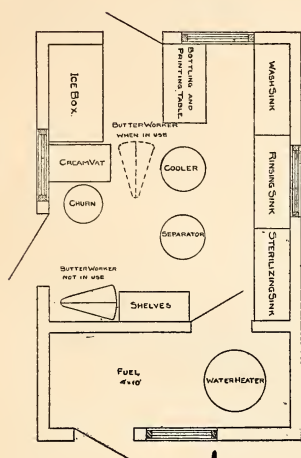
Ground Plan for Dairy House for 10 to 20 Cows.
